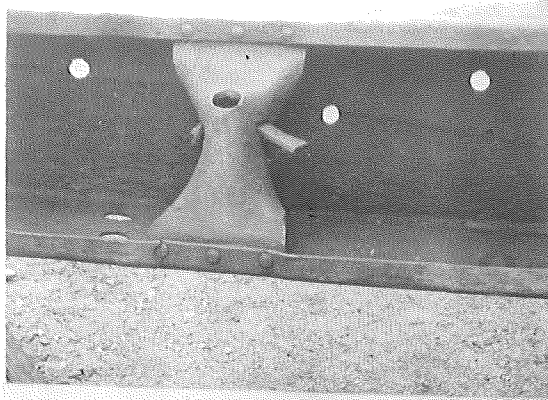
View of stake pocket on an old A form showing unserviceable pin lock and sheared rivet holes.
